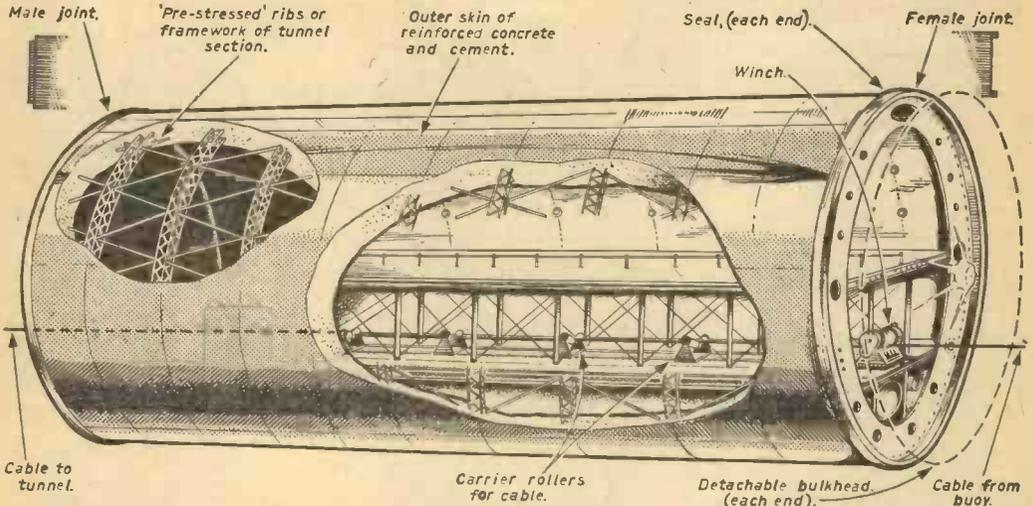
Showing the framework of a section of the tunnel. The winch, carrier rollers for cable and bulkhead doors are removed when section is in position.
